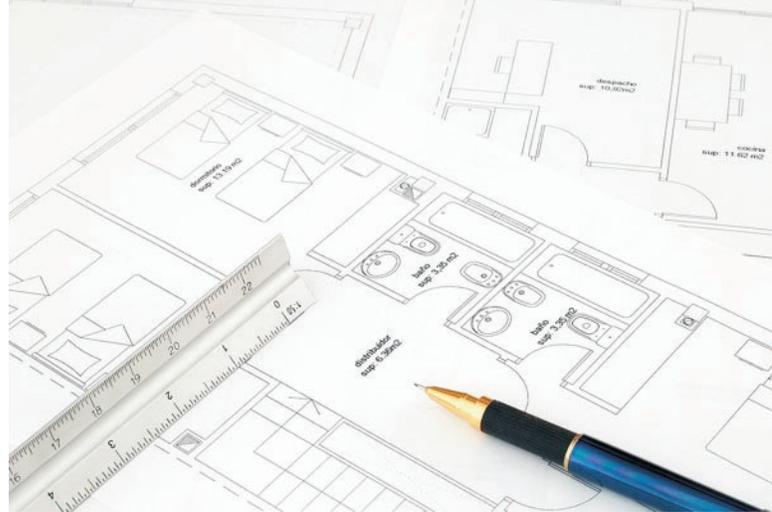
The architect's scale is commonly used for architectural and landscape plans and construction work.
